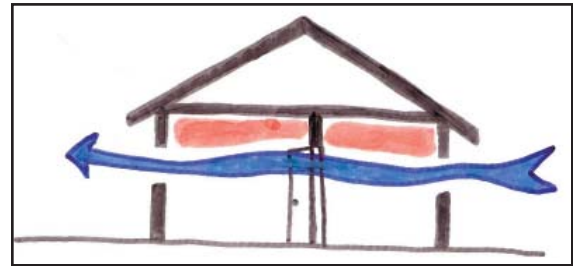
Cross ventilation with drop ceiling and partition wall with door open. More warm air trapped lower.
